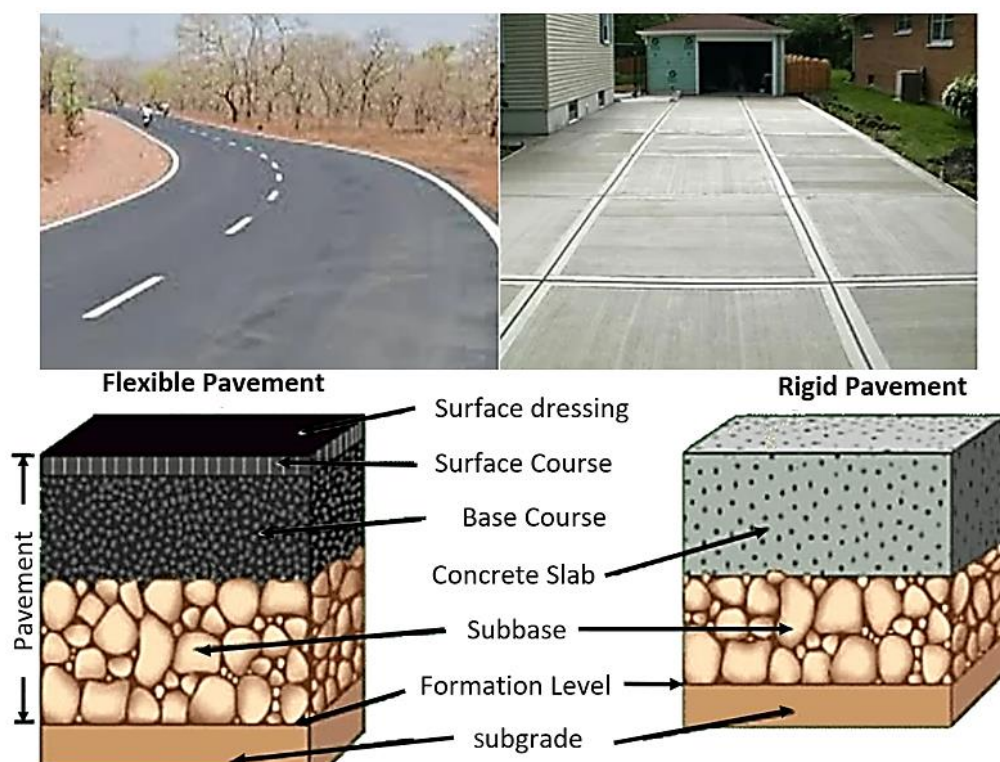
Difference between flexible and rigid pavement (Allaboutengineering, 2022)
